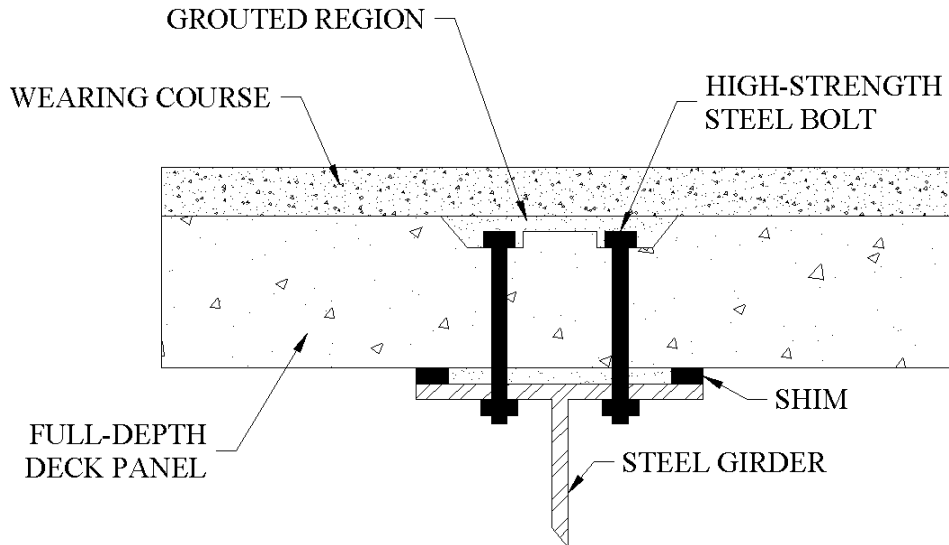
Detail of bolted connection (Issa et al. 1995b)
